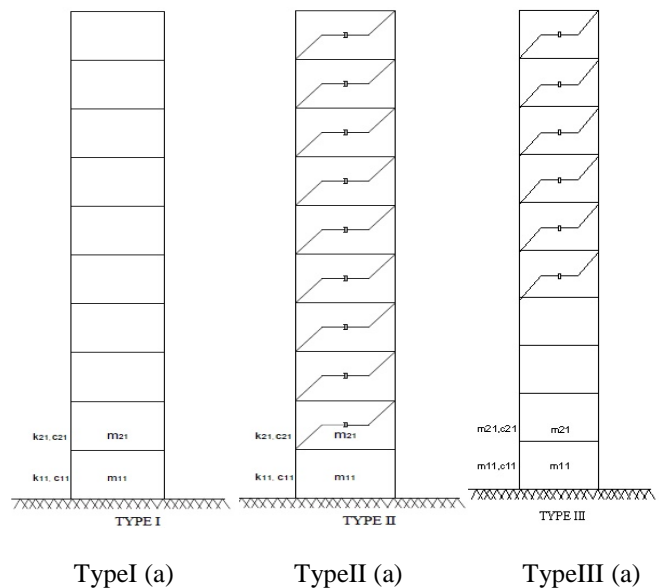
Structural Models of a MDOF Building Connected With SAVFD Dampers with Arrangements
